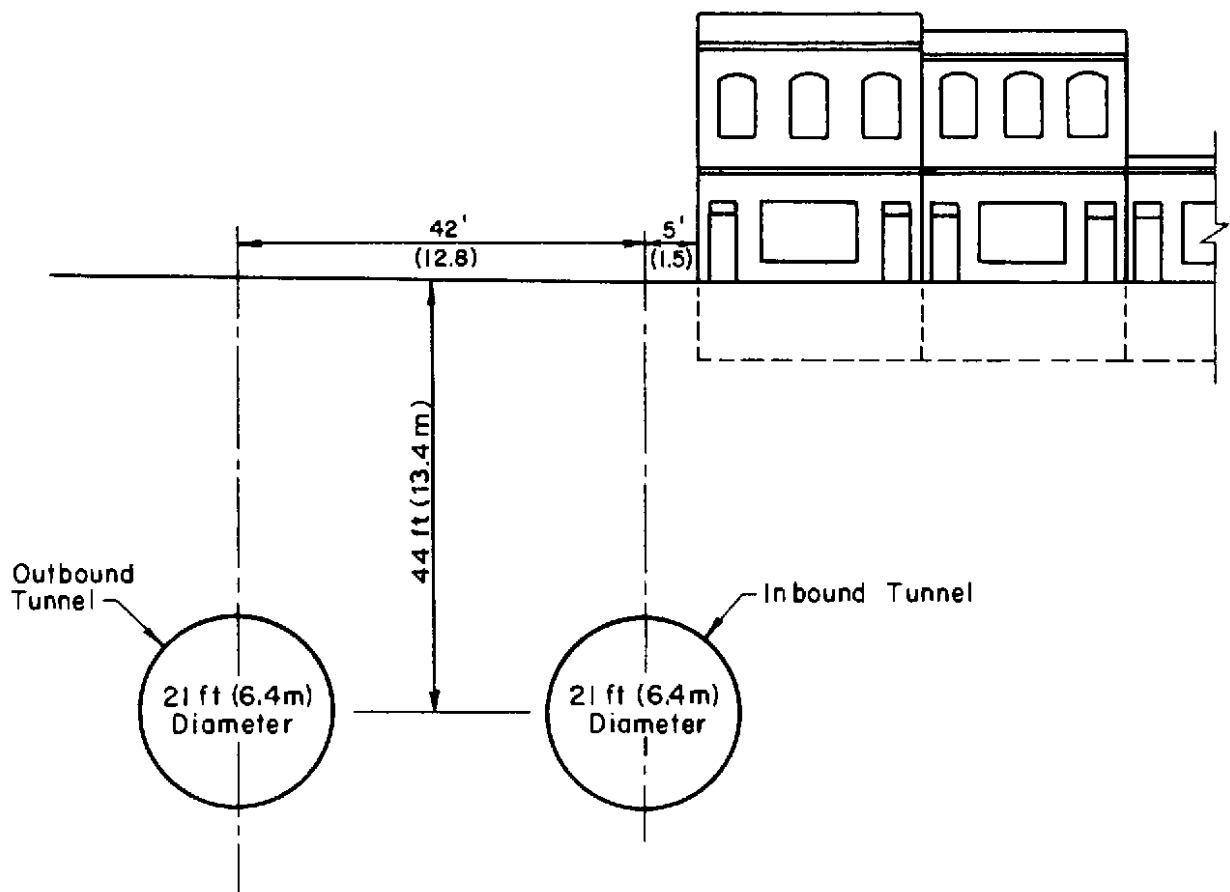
CROSS-SECTION AT SETTLEMENT OBSERVATION LOCATIONS
